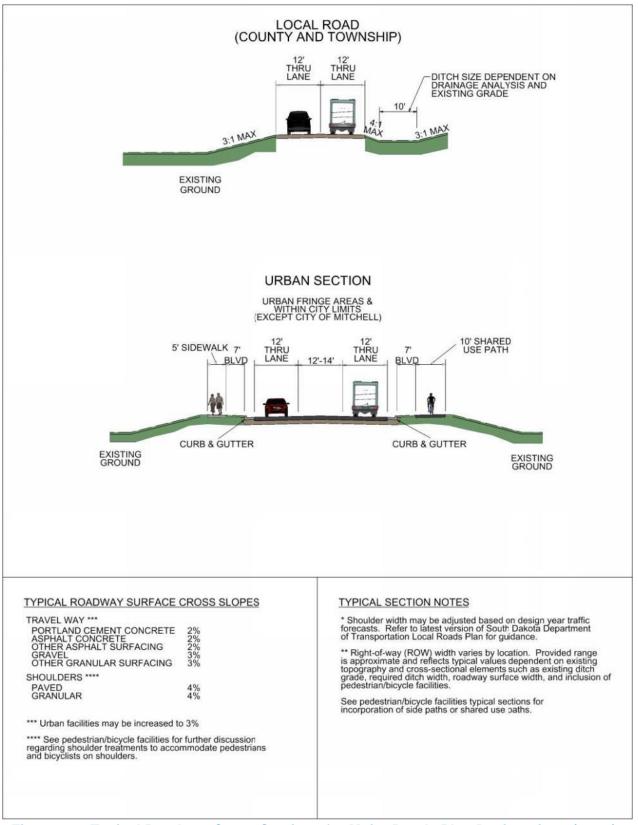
Typical Roadway Cross-Sections for Major Roads Plan Designations (cont.)
